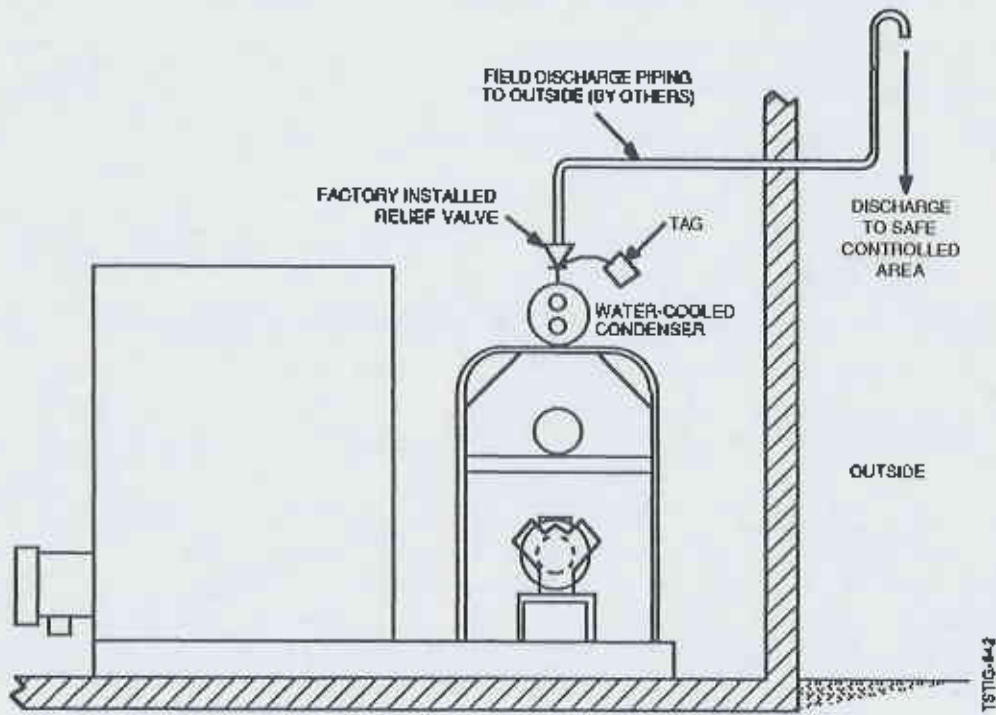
Typical Indoor Installation Relief Valve Piping
